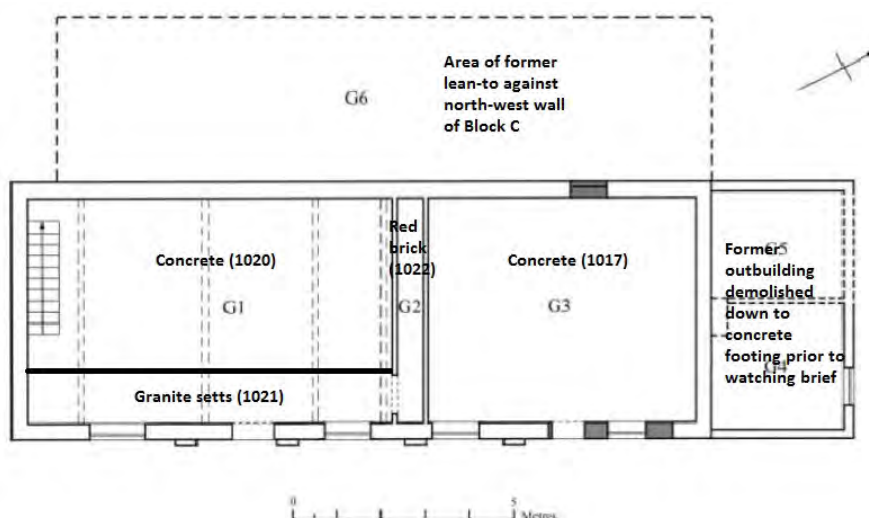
Block C ground floor plan prior to investigation (after Hradil and Nevell 2009, 99). Scale: as shown.
